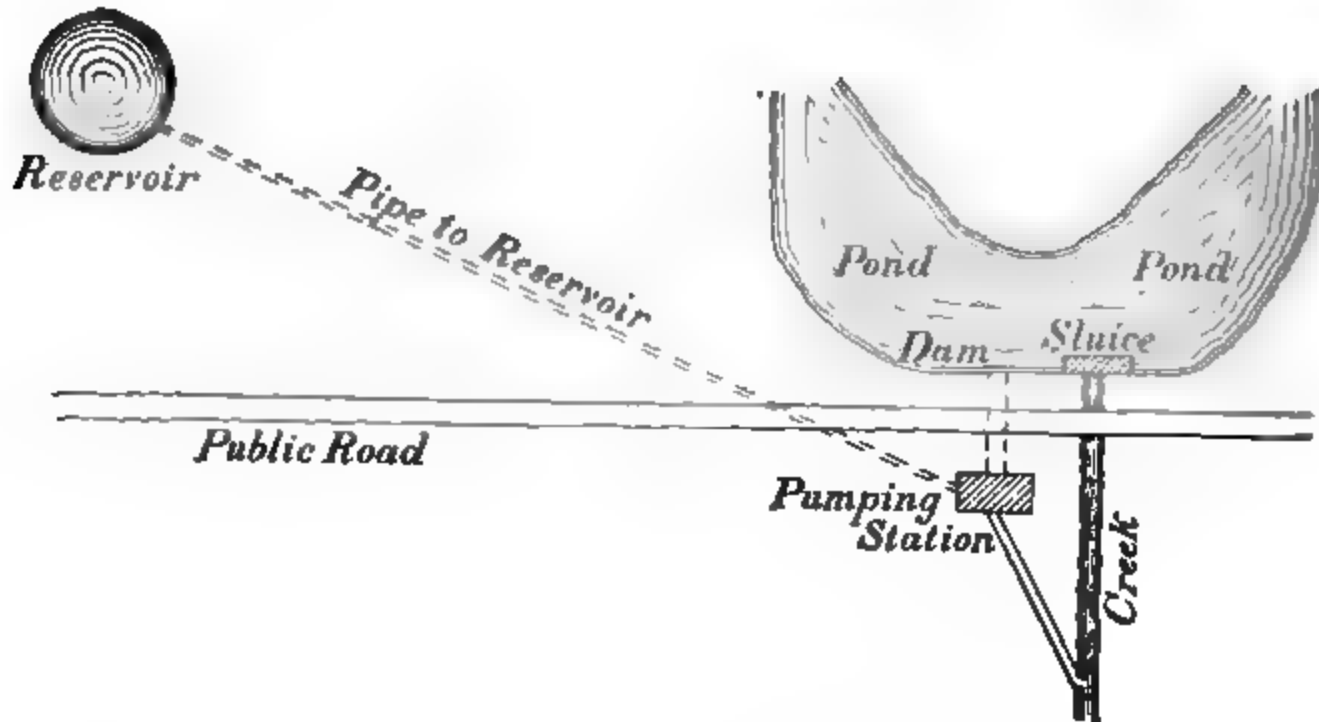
Irrigation plant on the farm of T. H. Whitney, Glassboro, N. J.
